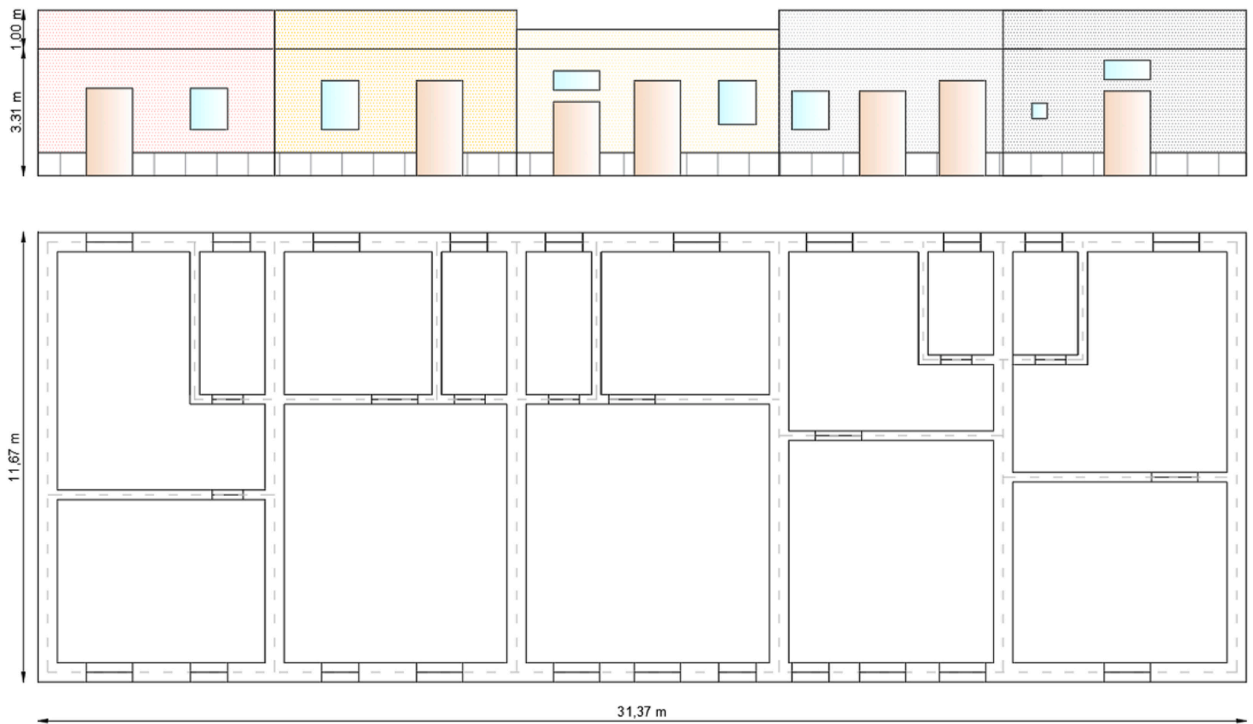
Drawings of the surveyed row masonry aggregate. From the top to the bottom, elevation view of the buildings and planimetric distribution of masonry panels. Reported measures are expressed in meters (m) limited to the base area sides and height of the focused masonry aggregate.
